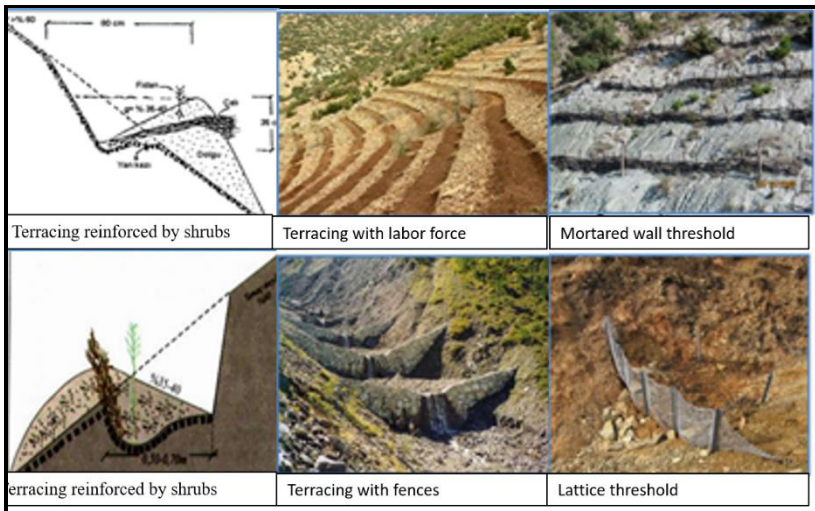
Terracing examples: a) terracing reinforced by shrubs (b) terracing with labor force (c) terracing with fences (d) mortared wall threshold (e) lattice threshold (URL-16,17,18)
